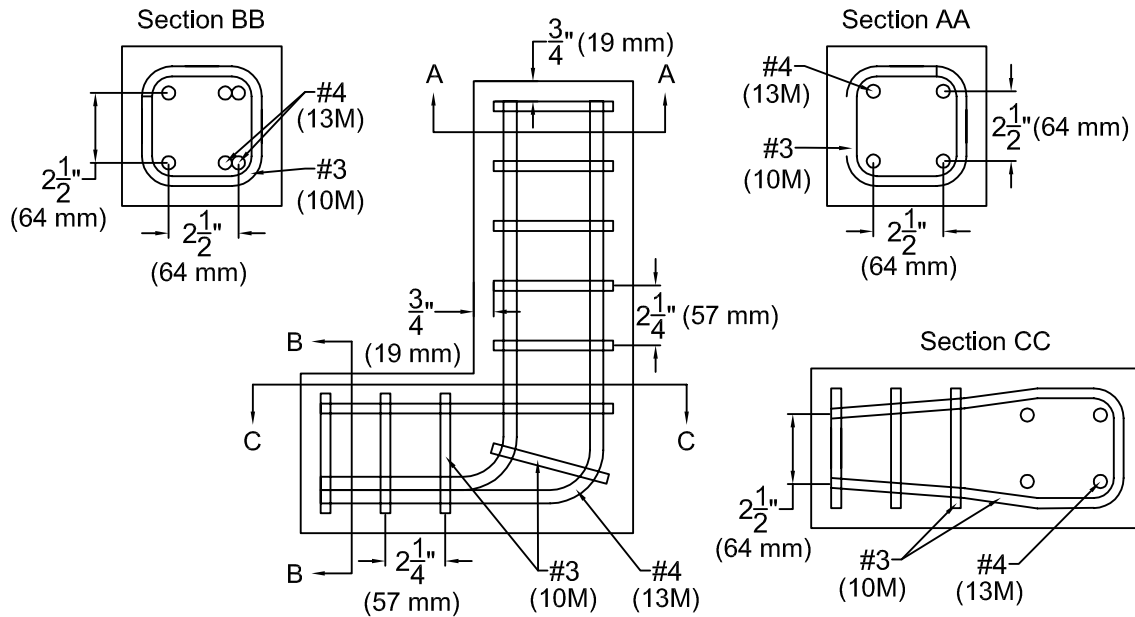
Individual concrete L-shape element steel reinforcement.
